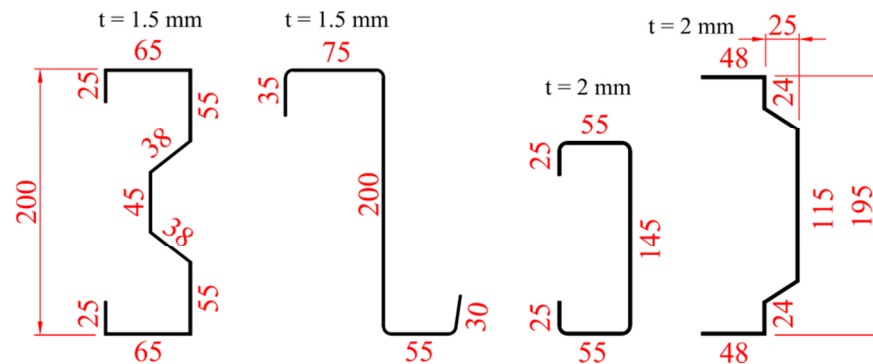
Profiles used to assemble the tested built-up members (Σ -, Z-, C- and track section)
